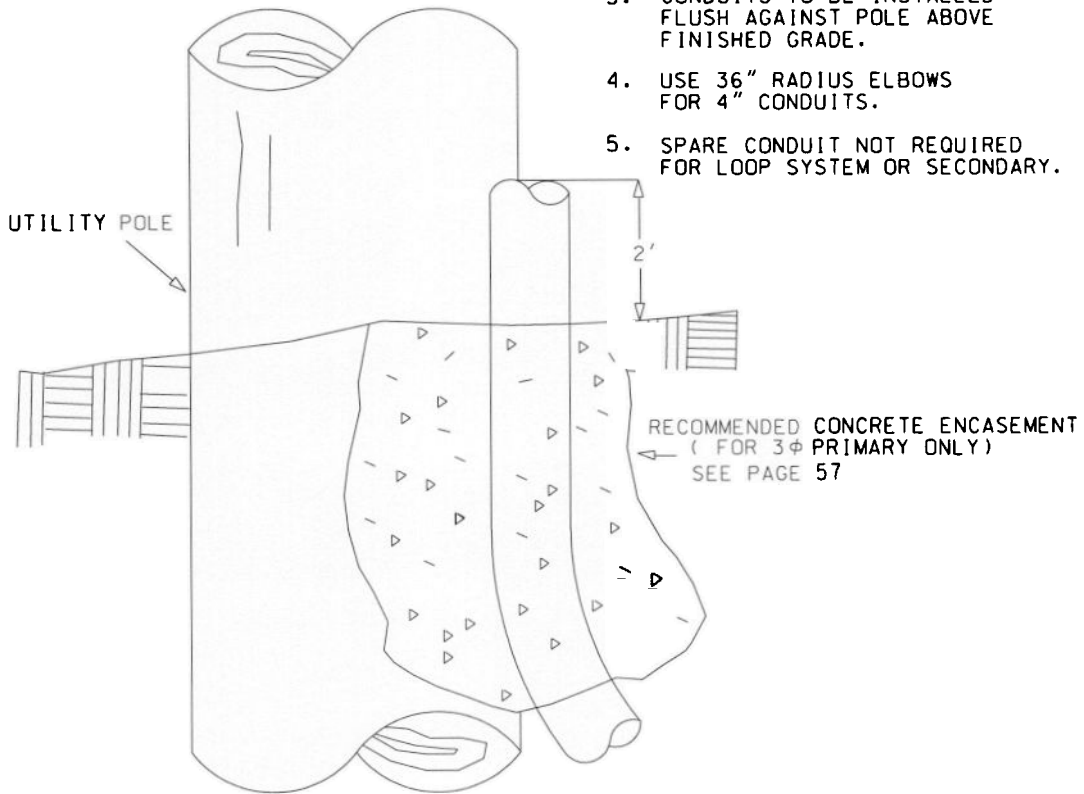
DETAIL OF CONDUIT INSTALLATION AT PRIMARY OR SECONDARY RISER POLE
